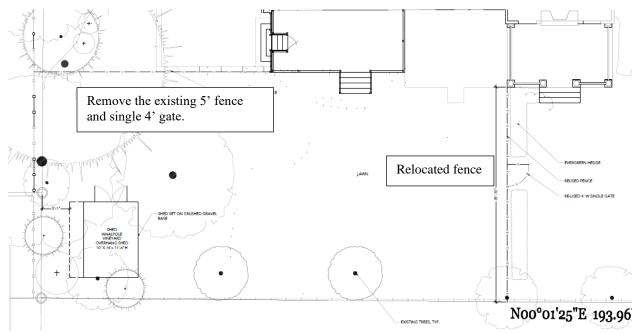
Site plan showing the location of the existing fence and its proposed location.
